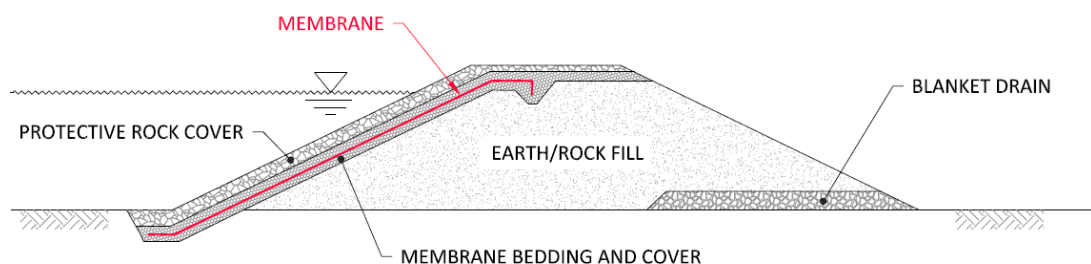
Typical cross section of simple earth dam with upstream facing of geomembrane
